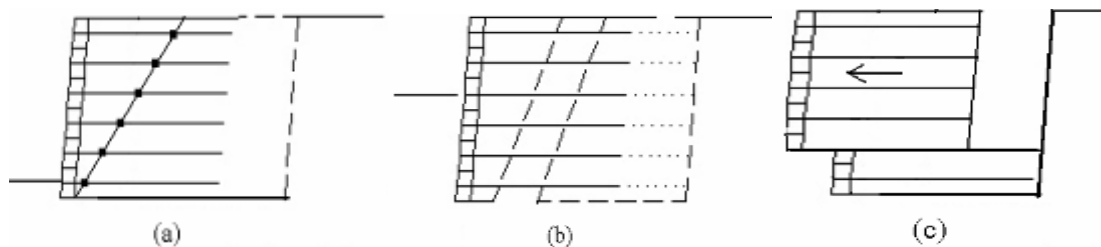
Possible internal stability collapses for reinforced earth structures
